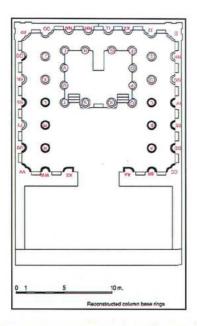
New plan of Temple cella showing proposed column interventions. Survey by F. Isaqat; edited plan by C. Kanel-lopoulos
